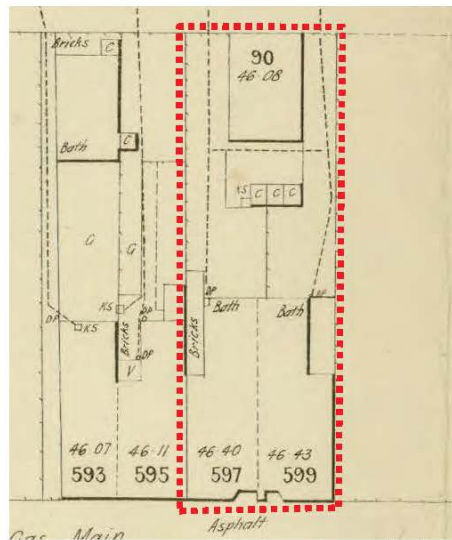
The 1901 MMBW plan shows the pair of buildings on the site (MMBW DP 1086).
